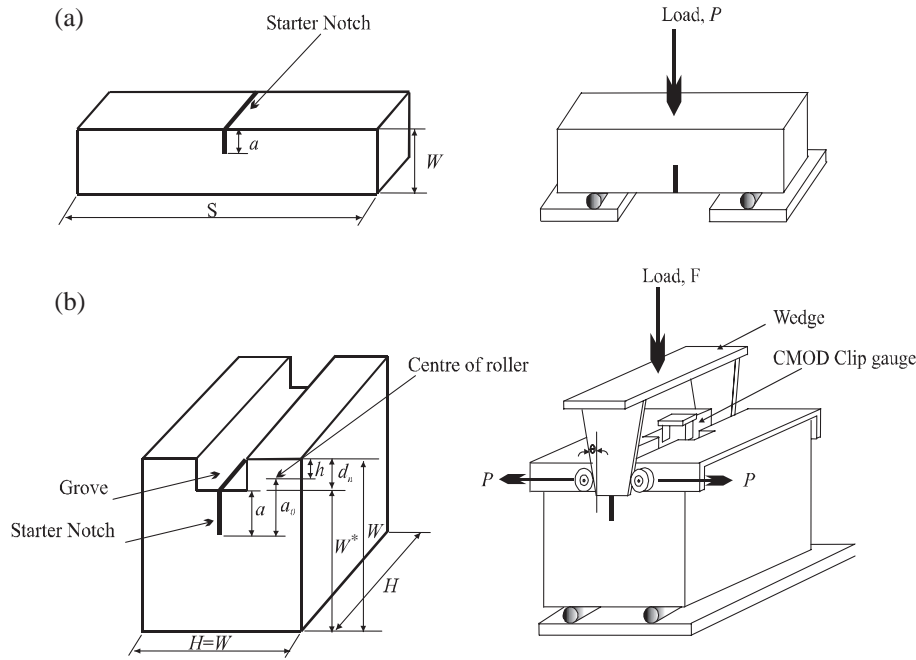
Geometry and loading arrangements: (a) TPB specimen; (b) WS specimen.
